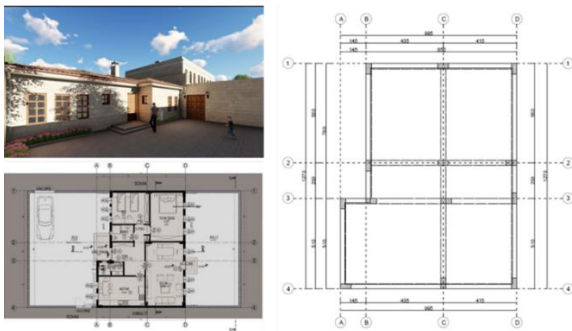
Schematic floor plan [23] and structural system application plan of the case study (Adapted from [23])
